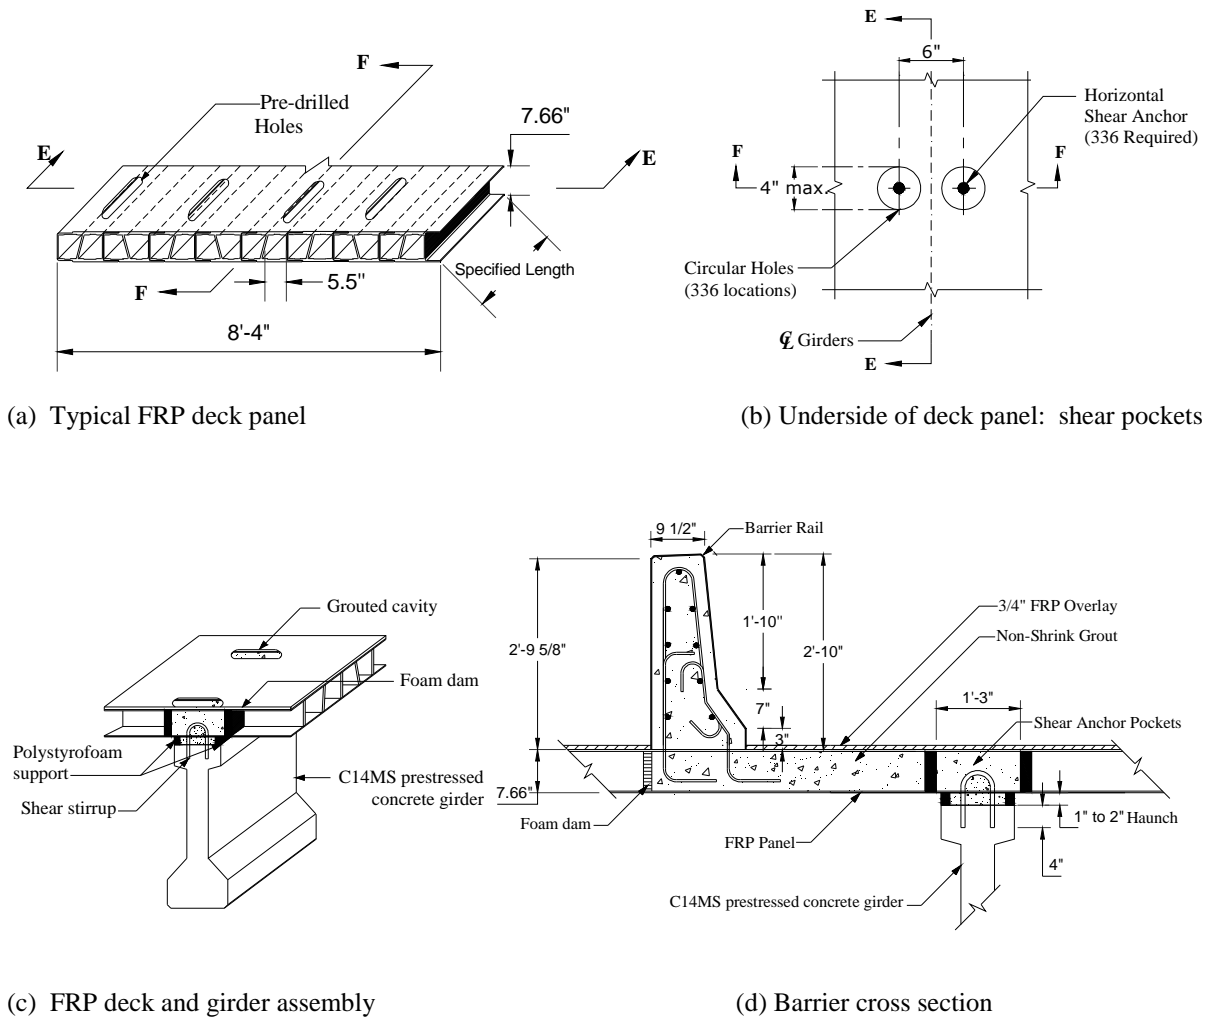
Typical FRP Deck Panel and Prestressed Concrete Girder
